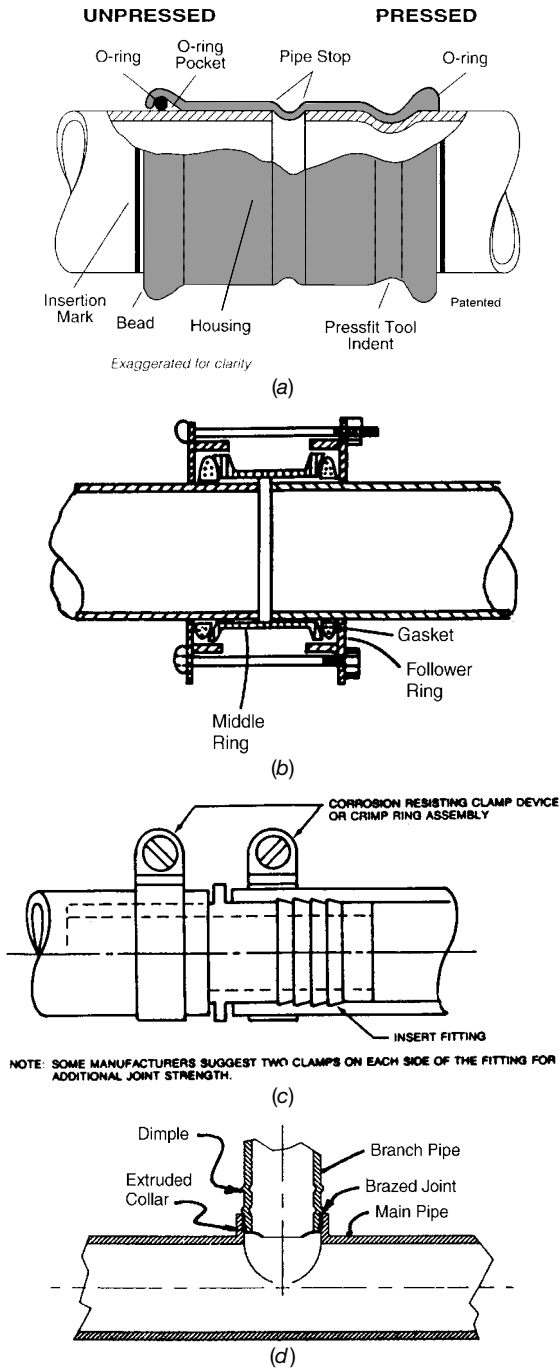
(a) mechanically pressed joint; (b) compression sleeve coupling; (c) plastic insert joint; (d) mechanically formed joint.
